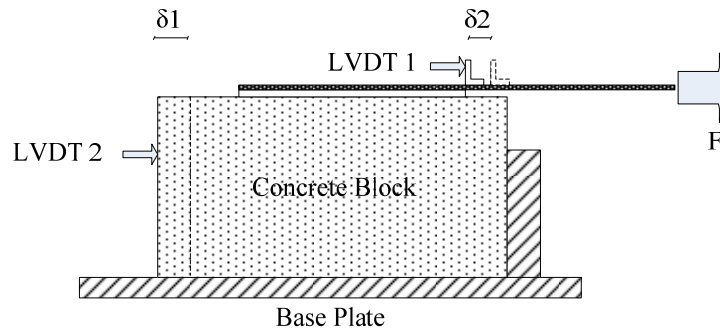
Slip between FRP and concrete in the single lap shear test set-ups.
